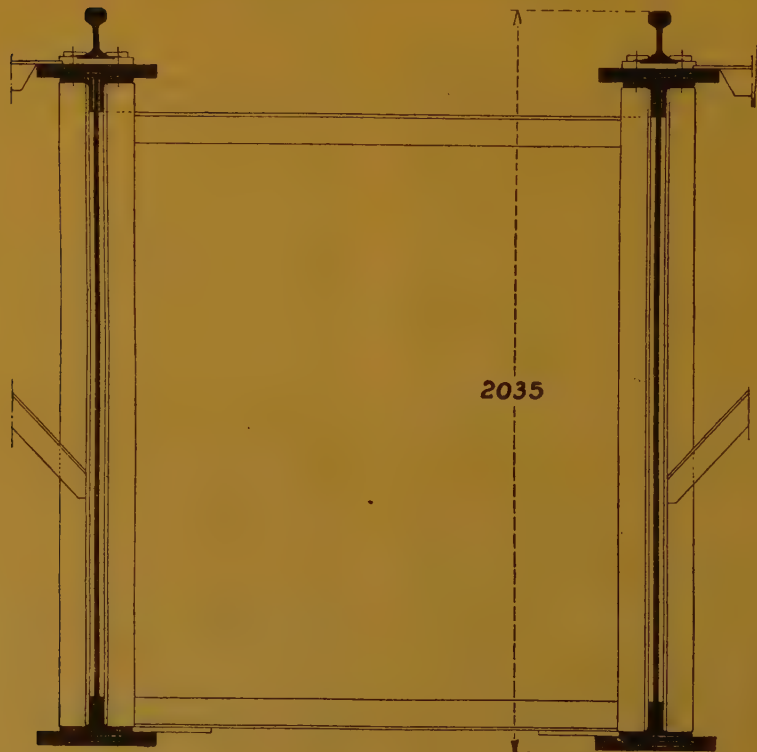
Cross section of 18 m. (59 foot) turntable.
